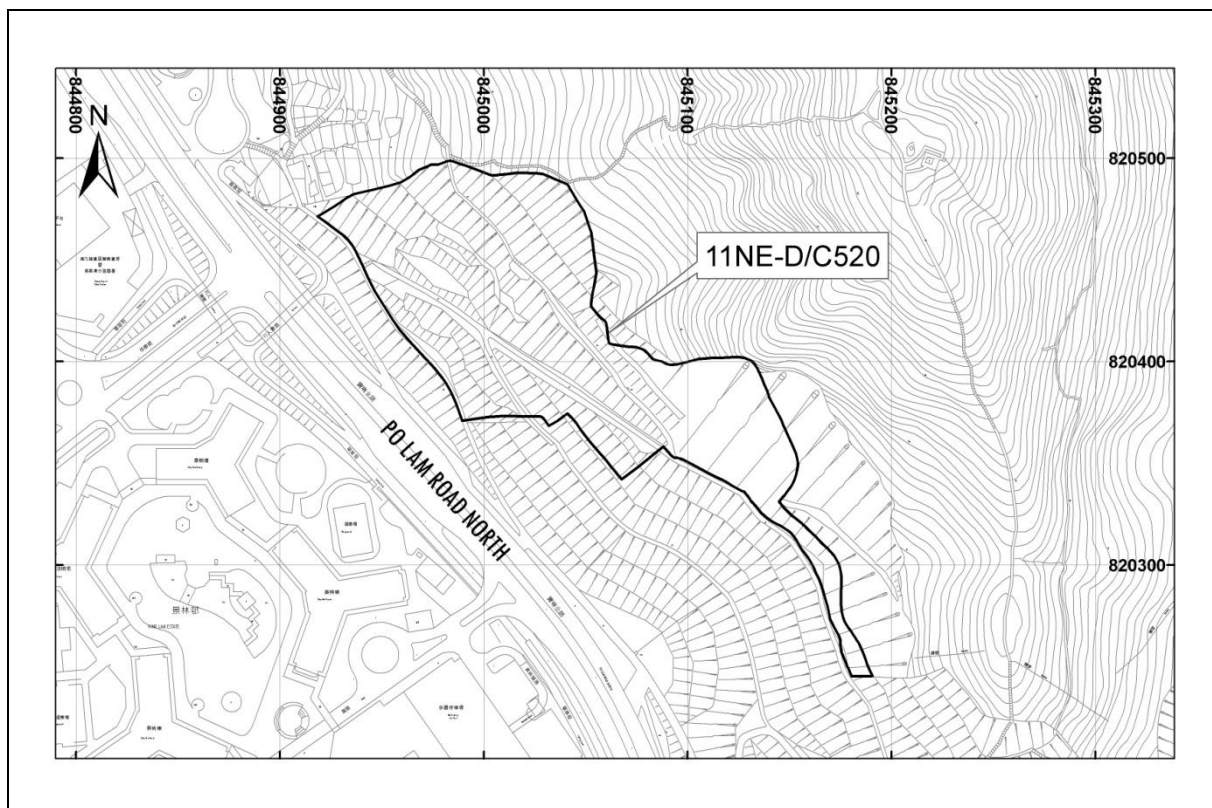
Location Plan of Slope No. 11NE-D/C520 at Po Lam Road
